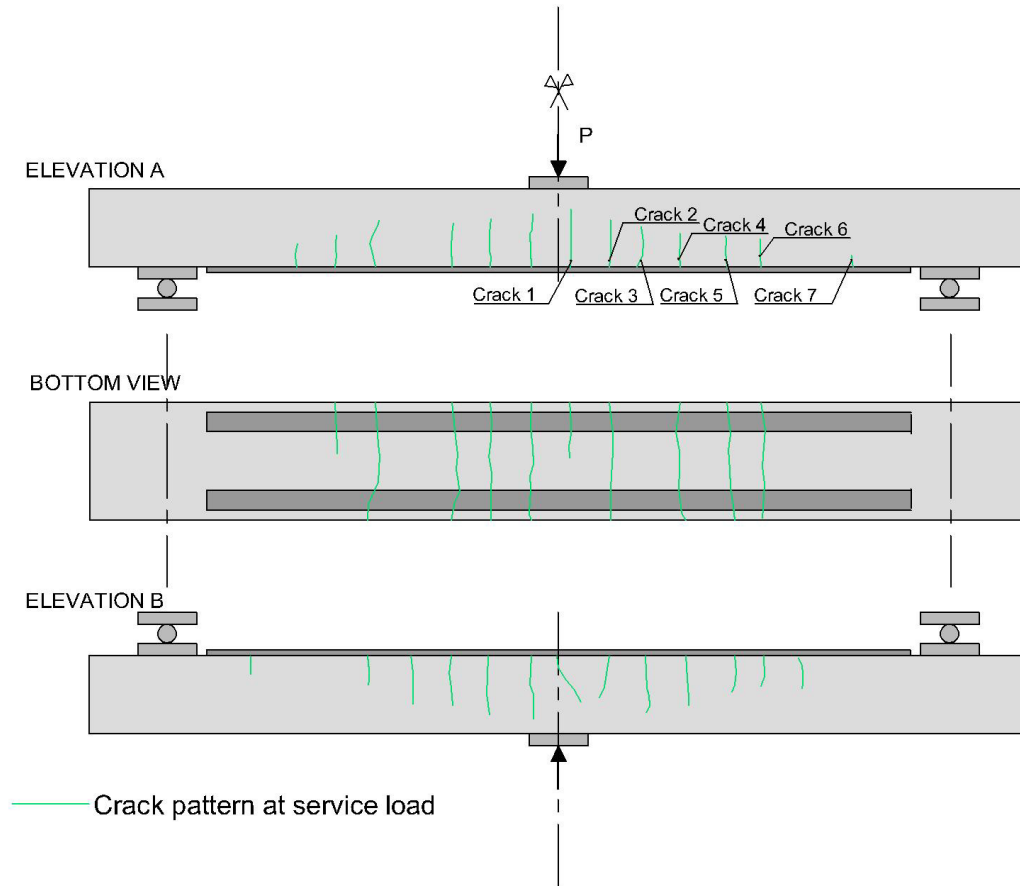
Crack pattern in Beam 2/C prior to strengthening.
